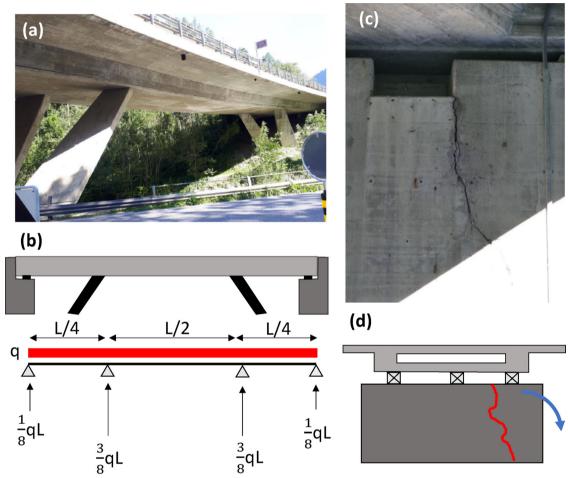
Presentation of Bridge I and detected damage. (a) Photograph of the bridge; (b) Static system; (c) Photograph of the crack at the abutment; (d) Scheme of the potential long-term damage due to the crack.
